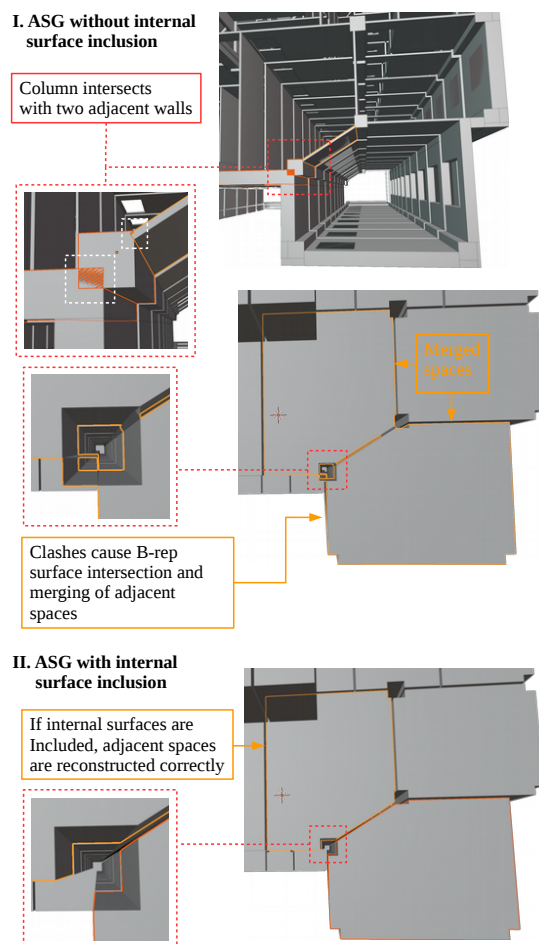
Examples of wall-column clashes affecting ASG in Torre Turina building (I) and correct space reconstruction after internal surface inclusion (II).
